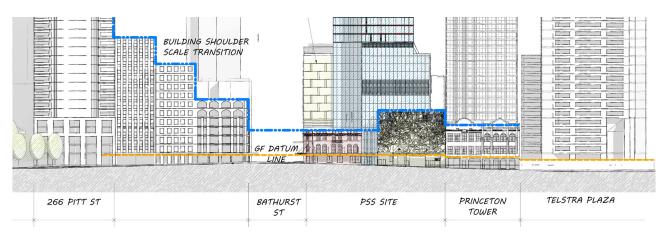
Indicative Street Wall Response - Pitt Street Elevation
